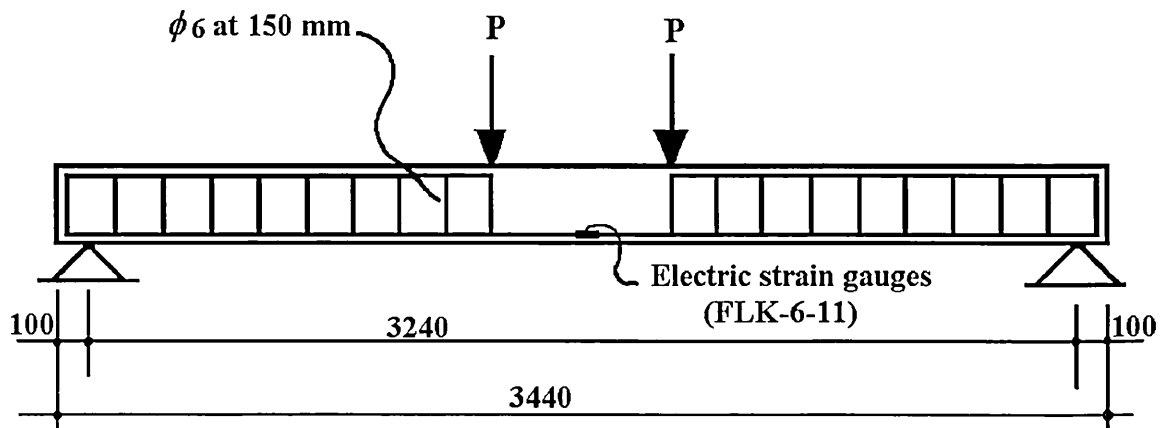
b-Reinforcement Details for the Singly Reinforced Test Specimens
